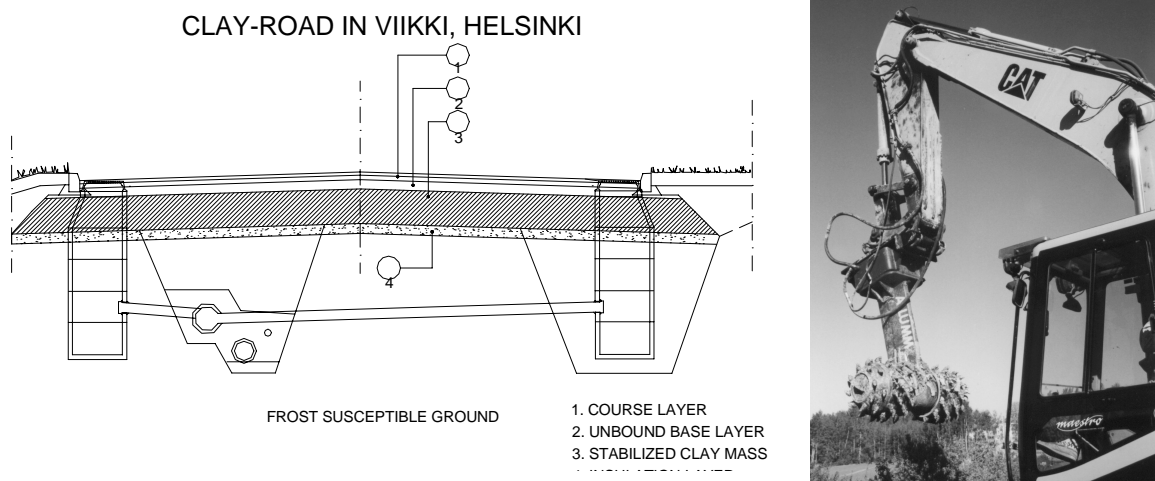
Cross-section of test structure and mixer attached in place of a shovel to a hydraulic excavator.
